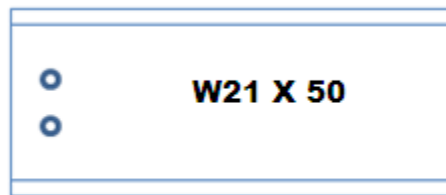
Single Angle Connection Bolt Pattern for the Girder
